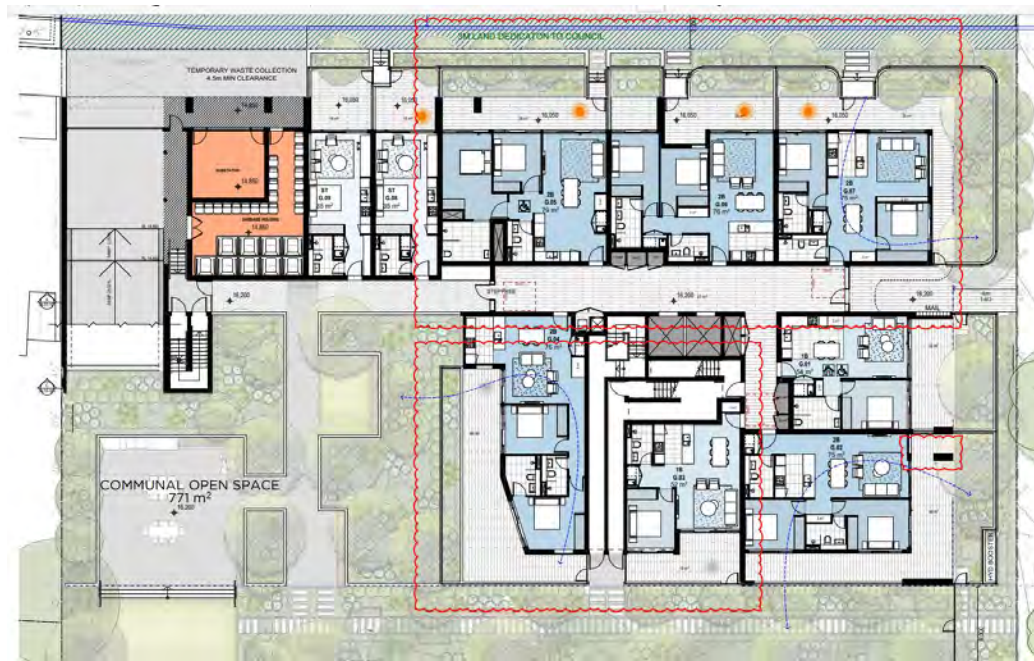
Approved DA2016/17/2 ground floor plan showing COS area.
